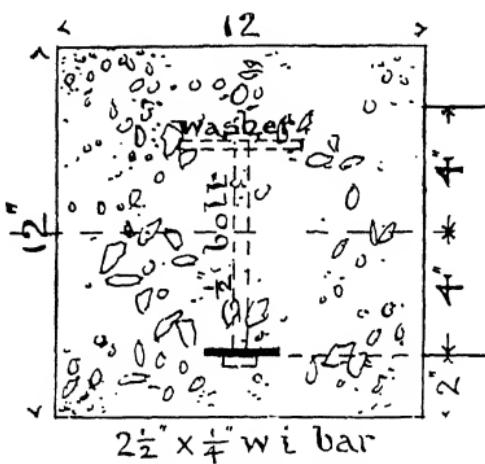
Section of Concrete Beam with Iron Tension-bar.
